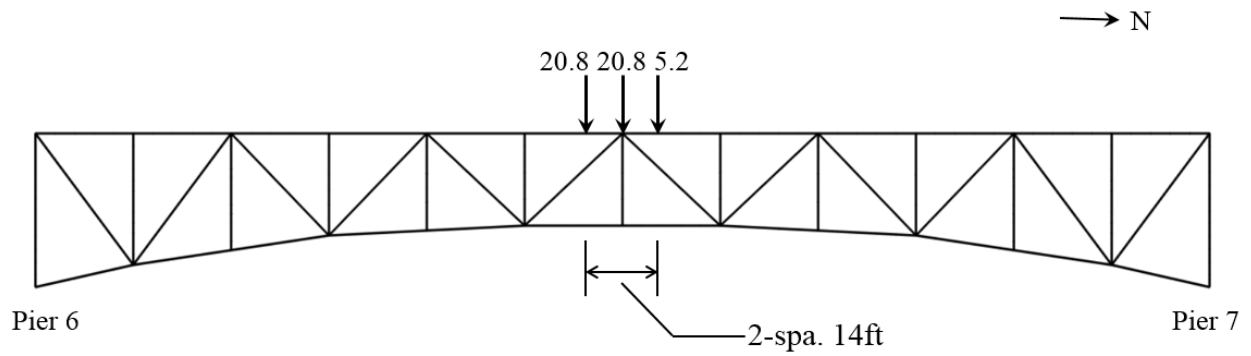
Elevation view of the center span between Piers 6 and 7 showing the HL-93 truck loads (unit: kips) that were applied to each of the eight traffic lanes
